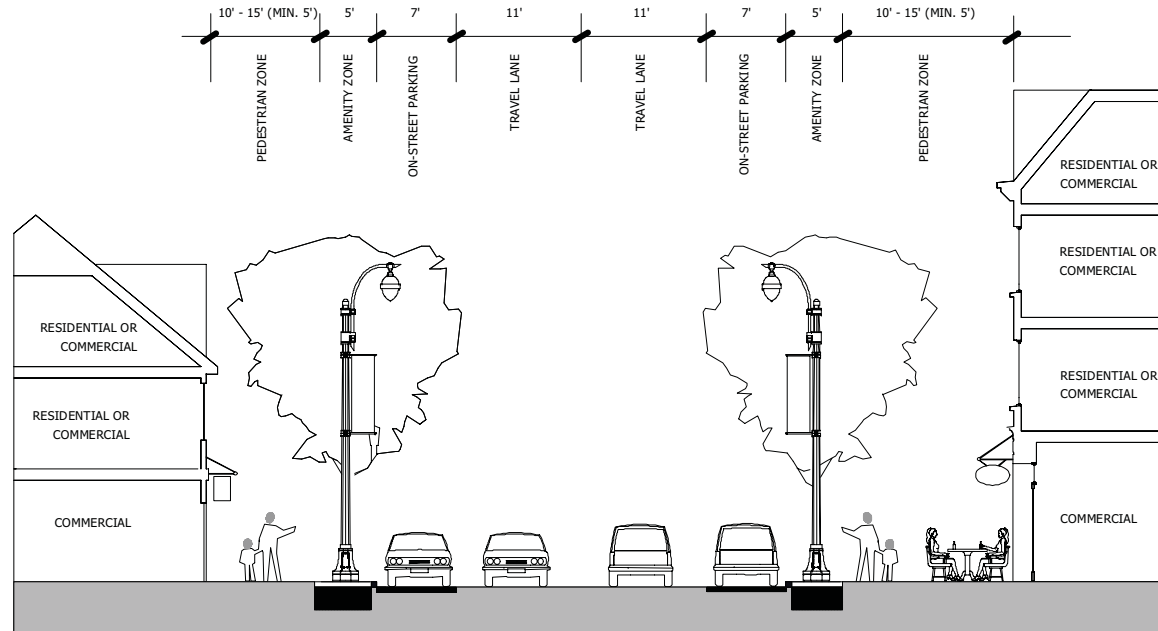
depicts the different zones of use within a streetscape starting with the face of the building, the sidewalk / pedestrian zone, the amenity zone, on-street parking, two travel lanes, on-street parking on the other side of the street and then another amenity and sidewalk / pedestrian zone and building façade. This is called a “complete street” because it has all the ingredients in the right proportion to accommodate the car and the pedestrian. A complete street may have variety, but it needs to be carefully planned over the long term to take advantage of new developments, infrastructure improvements or the implementation of other plans such as parking and public transportation improvements. These are all opportunities to strengthen Main Street as a civic place and a quality of place economic engine. Critical aspects of complete street components include:
